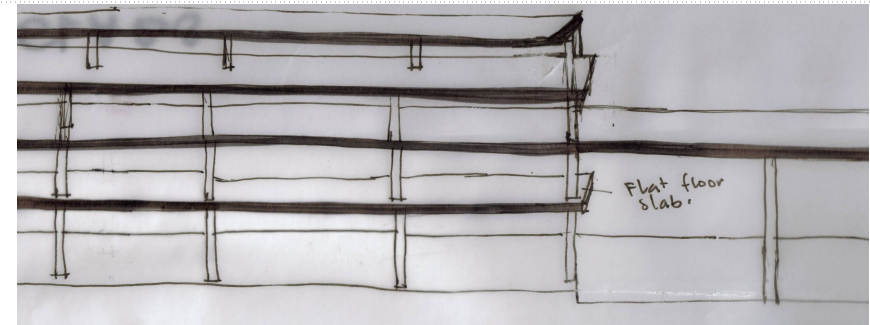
Conceptual slab sketch layout on administration block {May, 2006 (author)}.
